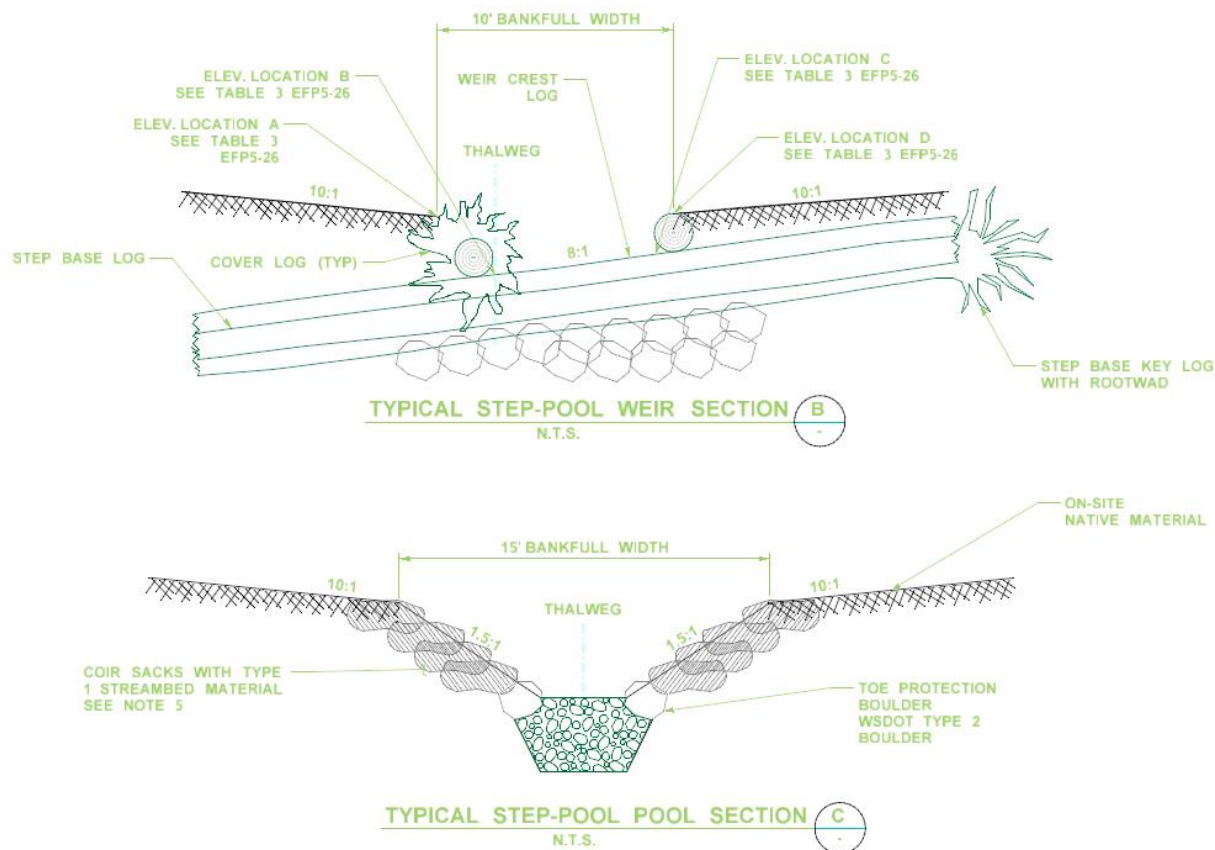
Typical Step-Pool Sections – Weir and Pool Sections
